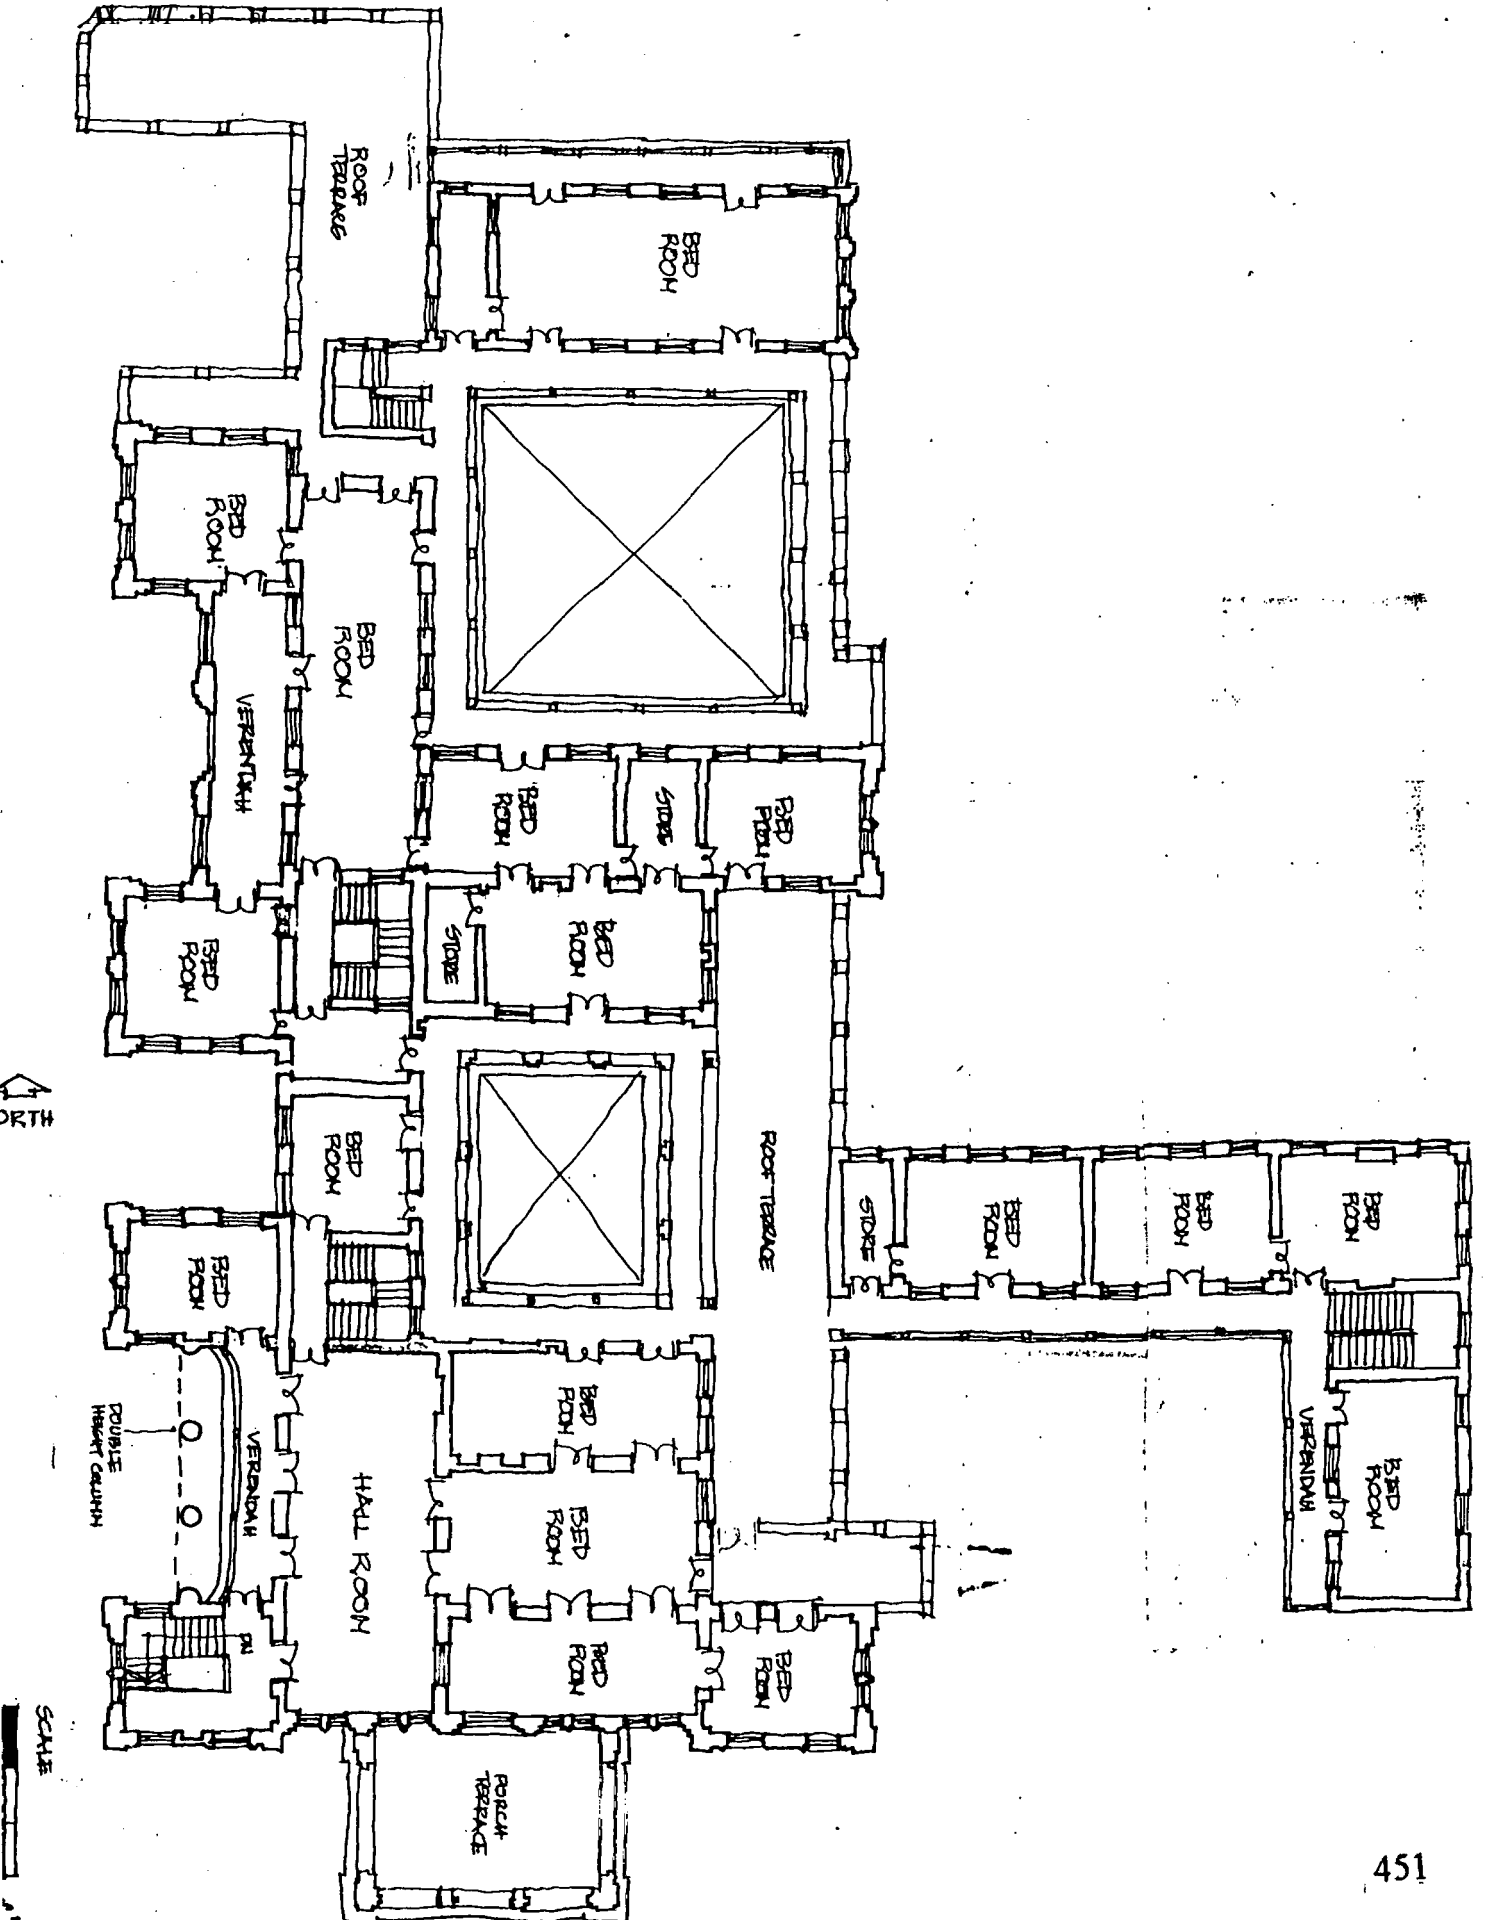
First floor plan, Reboti Mohan Lodge, sulrapur, Dhaka
